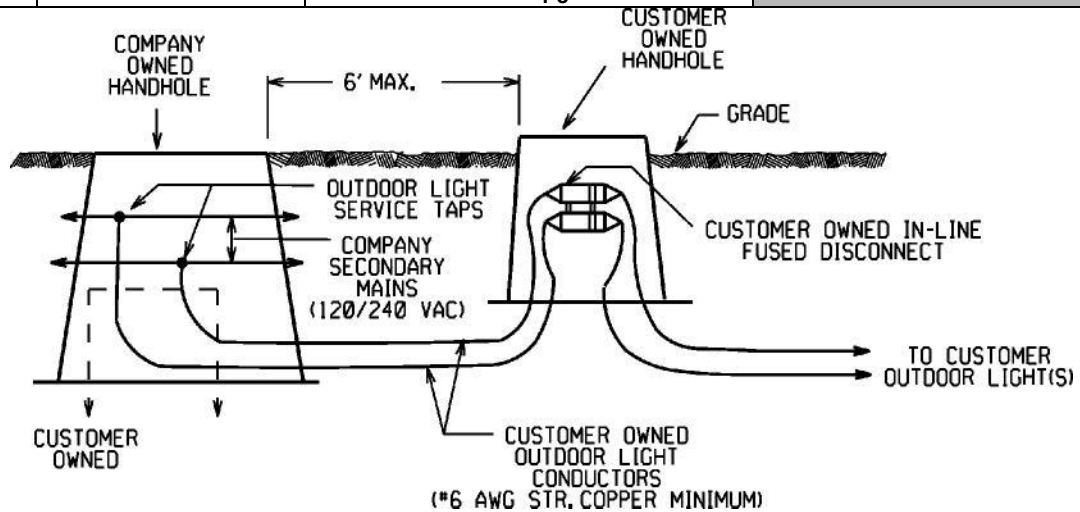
Connection of Underground Supplied Customer Owned Outdoor Lighting to National Grid Handhole or Manhole – Standard Connection
